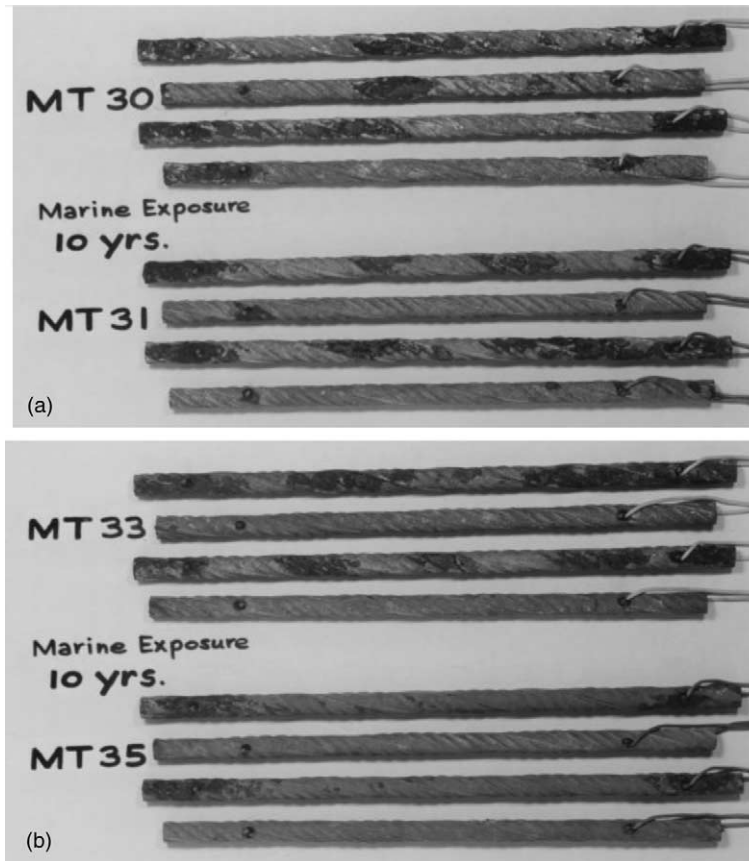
Reinforcing bars (recovered from concrete) after 10 years exposure—C35 concretes. (a) Rebars extracted from concrete with 0% pfa (top) and 15% pfa (bottom). (b) Rebars extracted from concrete with 30% pfa (top) and 50% pfa (bottom). Long bars had 10 mm cover and short bars had 20 mm cover. Note the absence of corrosion on the 20 mm cover bars from the concretes with 30% and 50% pfa.
